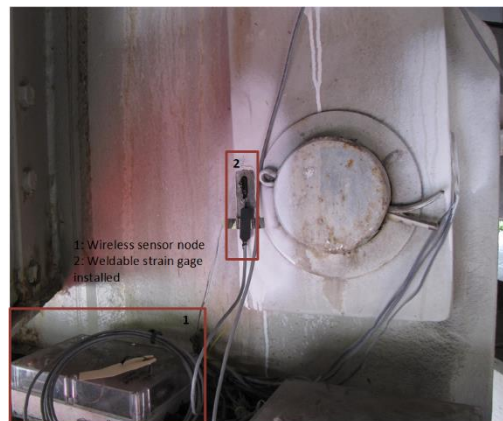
, Installation details on strain gage near bottom pin hole of middle girder
